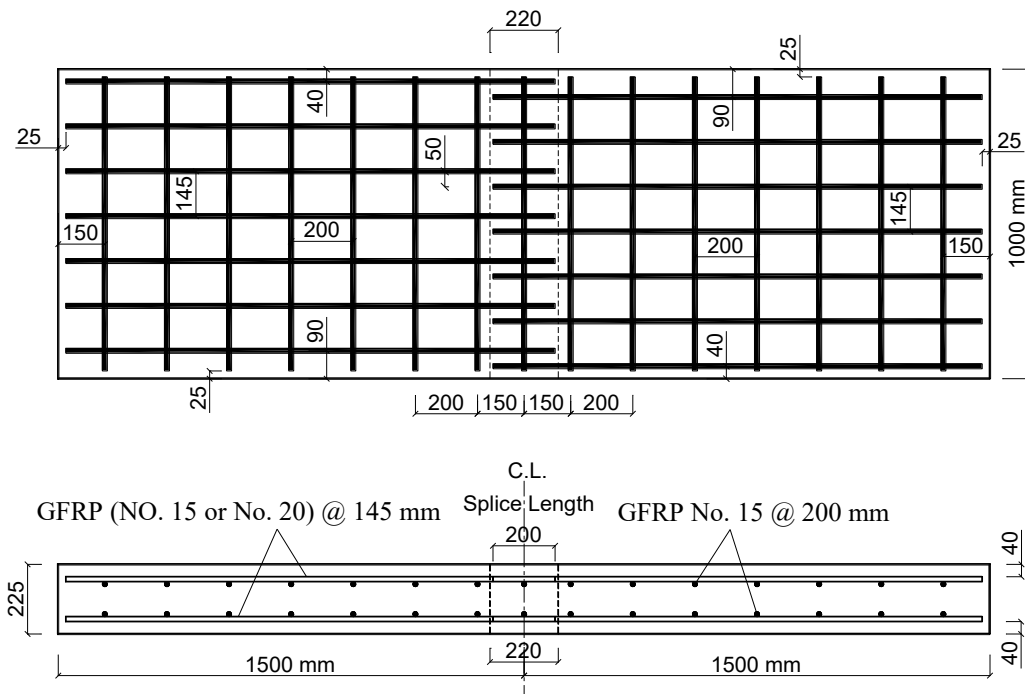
Concrete dimensions and reinforcement details of specimens G-200-15-B and G-200-20-B
